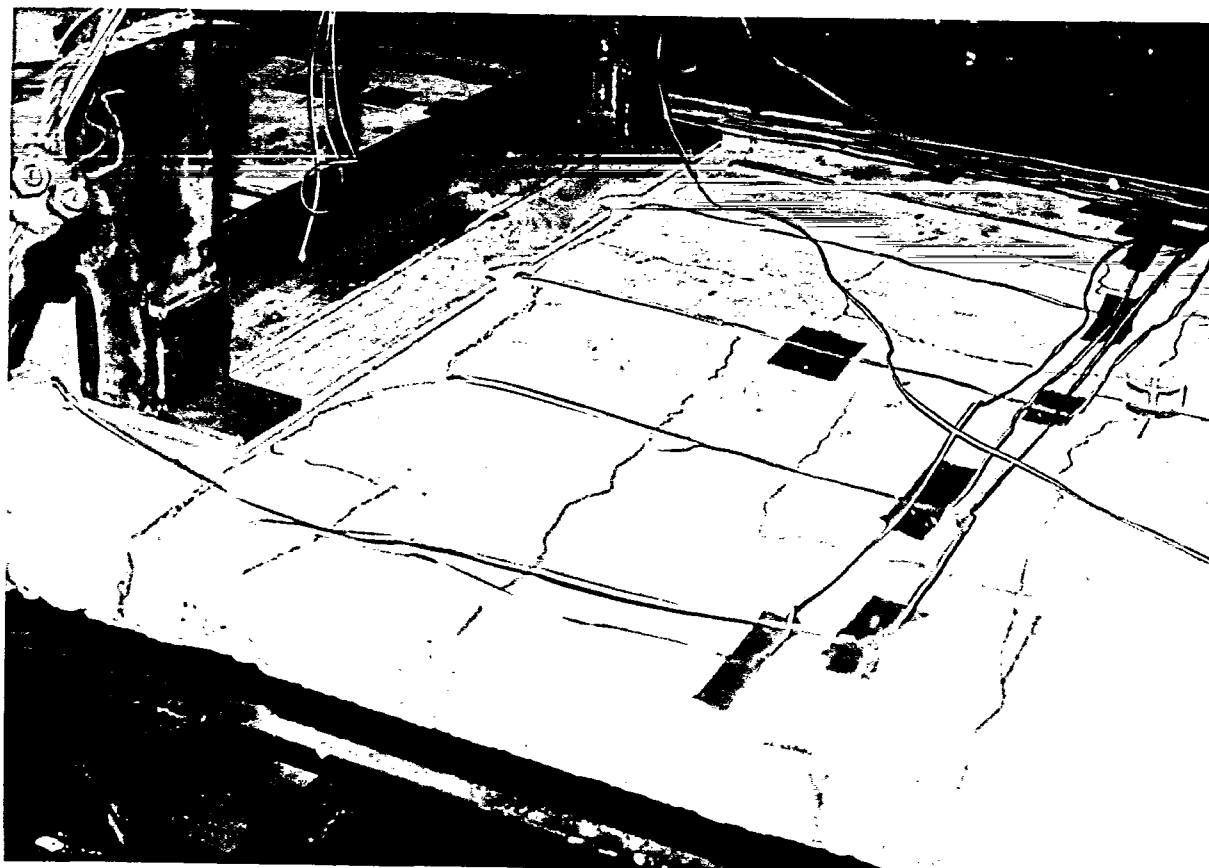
TRANSVERSE CRACKS IN THE CONCRETE SLAB AROUND THE INTERMEDIATE SUPPORT OF BRIDGE MODEL I
